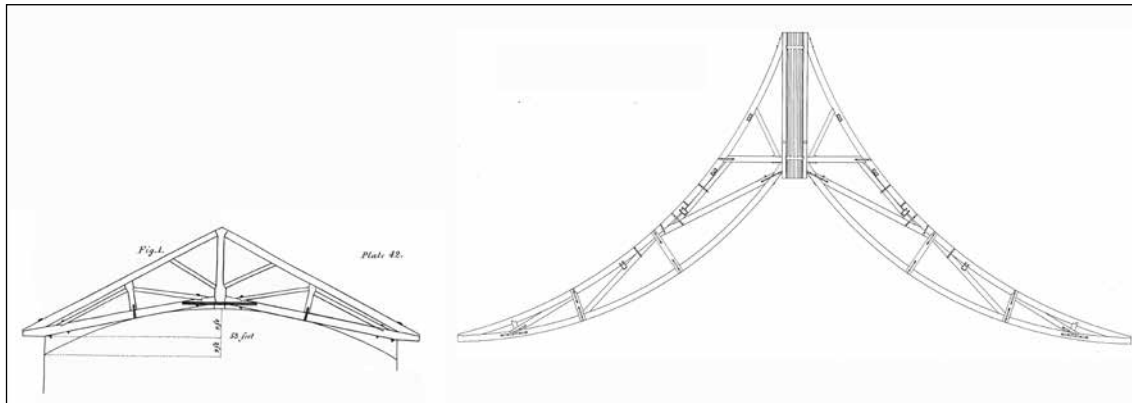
Divided tie beam truss arrangements as illustrated in Asher Benjamin's *American Builder's Companion* (1811; left) and in the Rotunda or 'Polygon Room' (1814; right; © Historic England).
